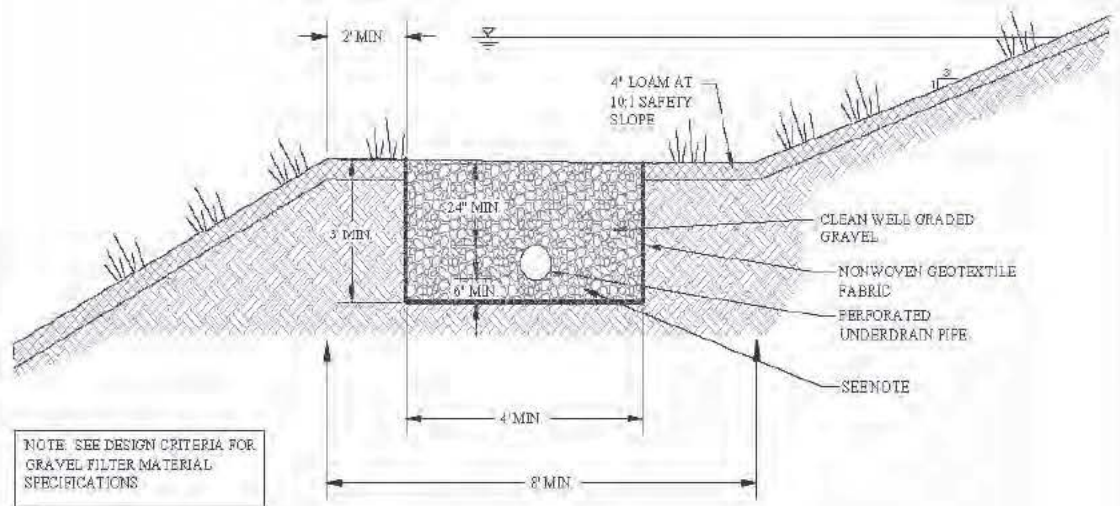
TYPICAL WET POND WITH UNDERDRAIN OUTLET
